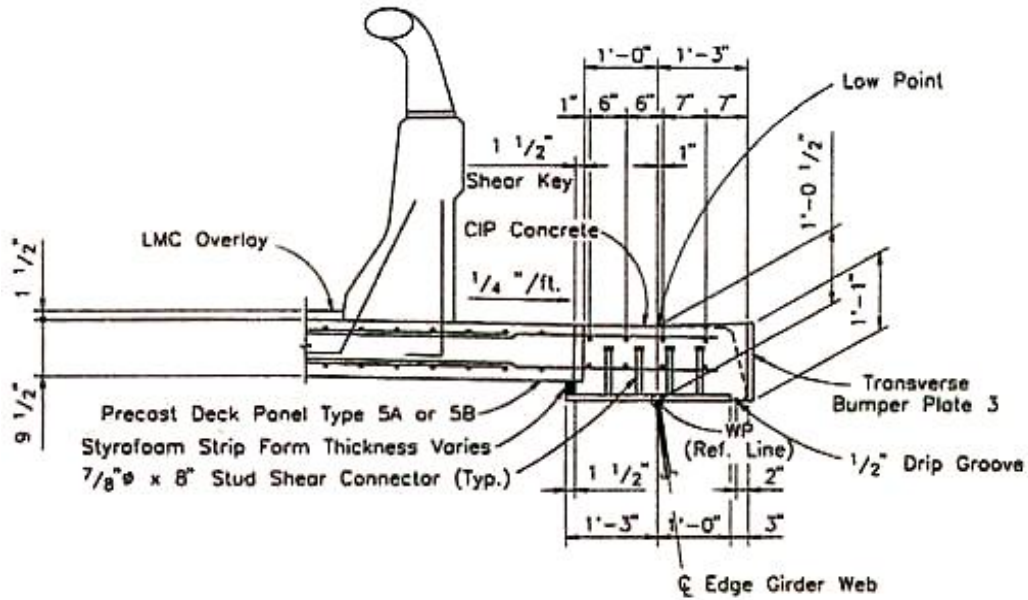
Connection detail of precast panel with the barrier and the exterior girder
